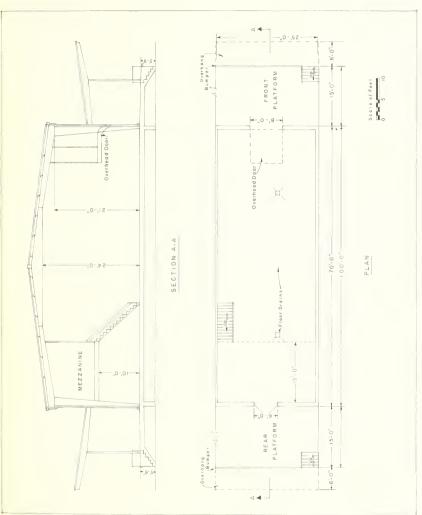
Possible layout for a 25-foot unit in the proposed market for handling fruits and vegetables and groceries and other products in San Juan, P.R.
